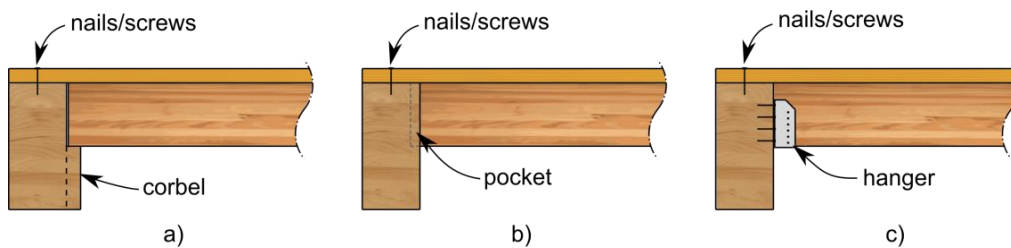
Suggested floor to frame connections (floor joists flush with beam): a) floor joist on corbel, b) floor joist in pocket, c) steel bracket/hanger
